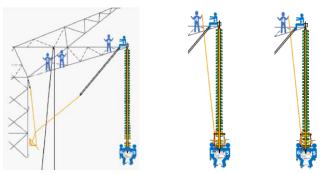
Steps to change damaged insulator near pole side using the equipment
